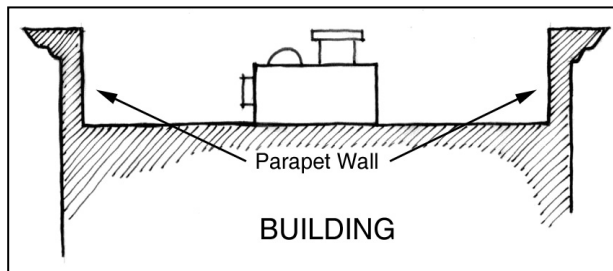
I: Example of how parapet walls are utilized to screen roof mounted mechanical equipment.
